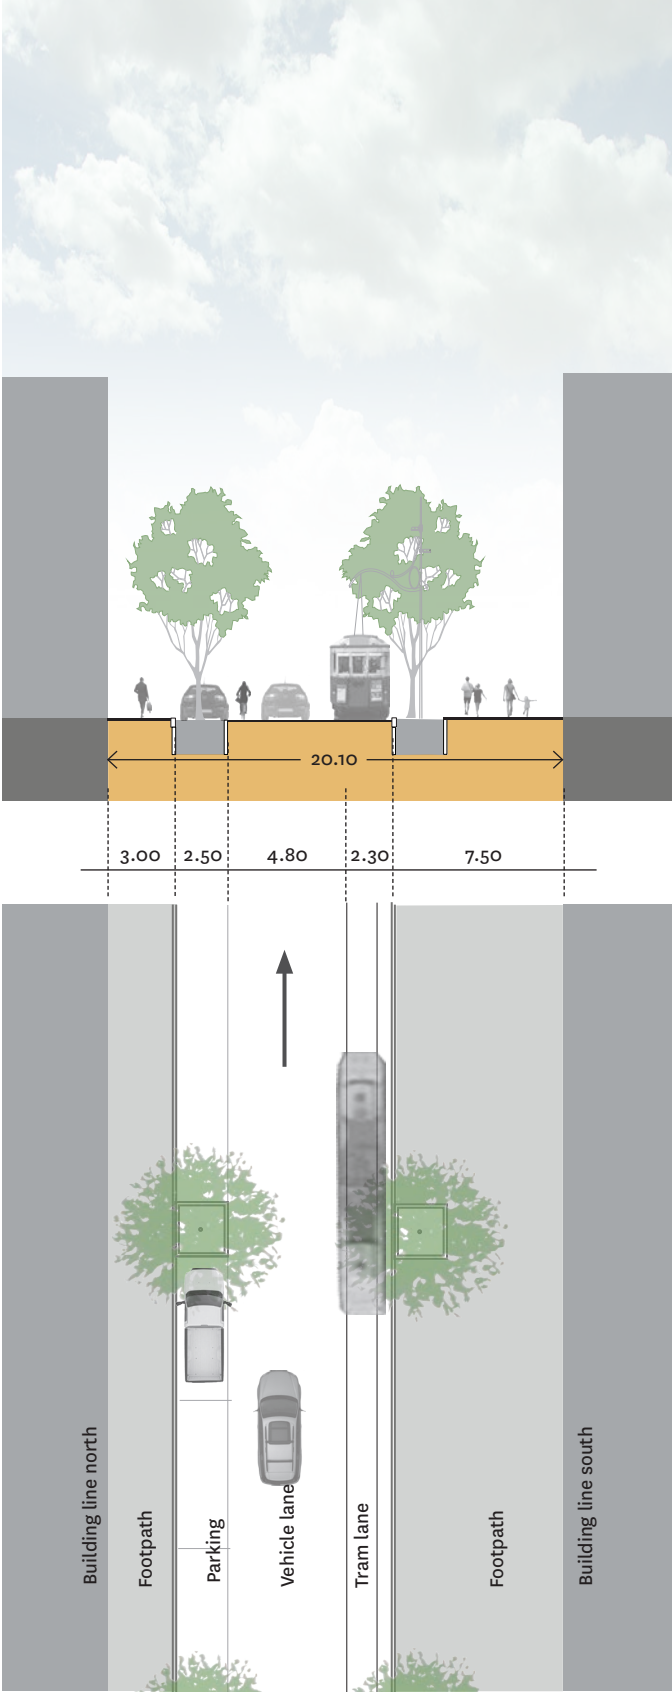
B2 – Existing cross-section of Worcester Boulevard
